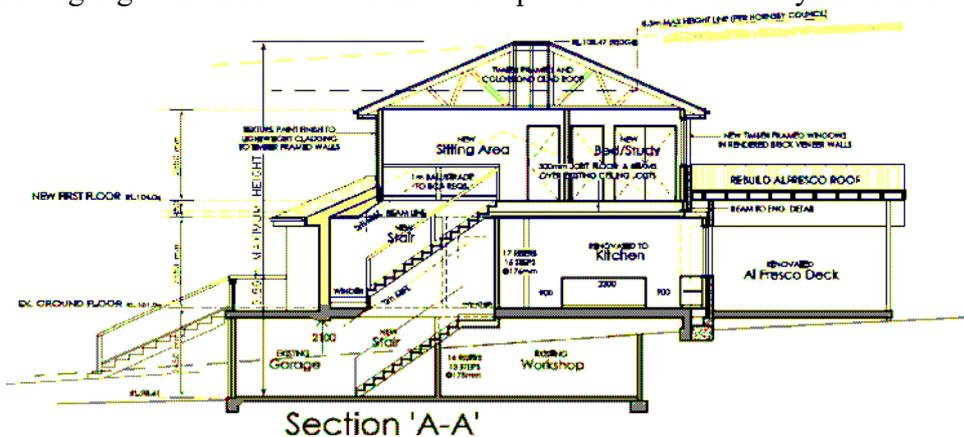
Section showing building height notations (maximum 8.3m from ground level, maximum 9.86m where measured from basement floor level
